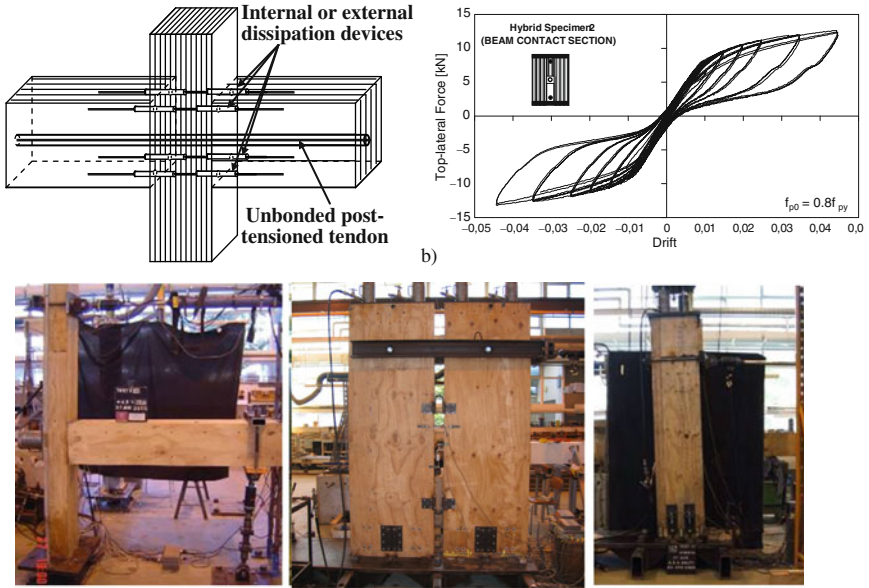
Concept of hybrid jointed ductile connections for LVL timber frame systems and experimental campaign on beam-column joints, wall systems and column-to-foundation connections
